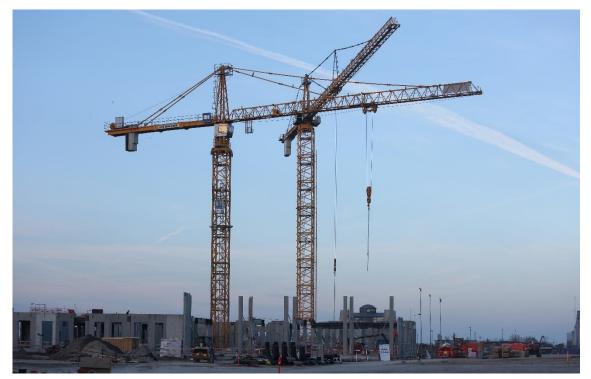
CONSTRUCTION SITE. PHOTO BY DBI
